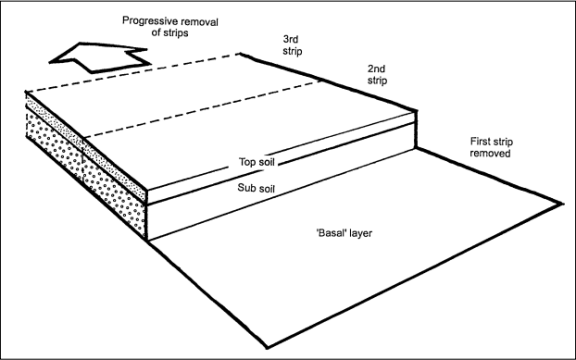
Topsoil stripping with towed earth scraper (Defra, 2009)
